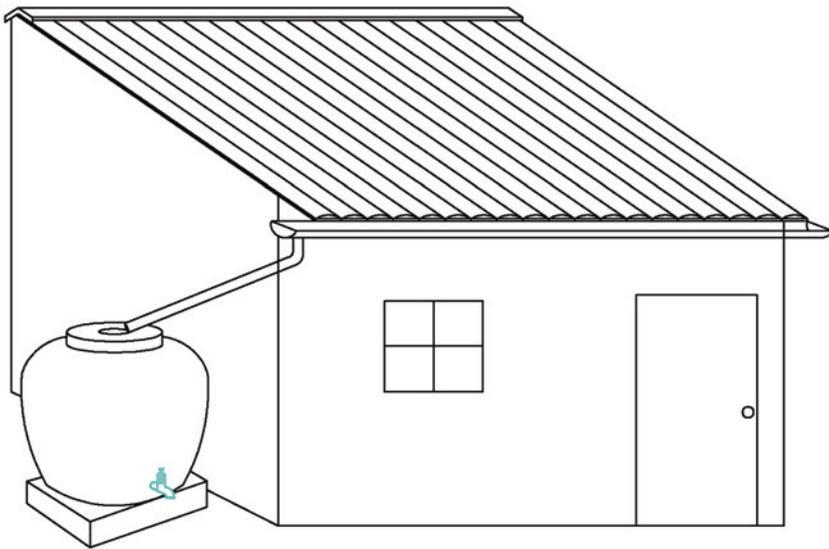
2 m³ 'Thai Jar' ferrocement roof tank common in S.E. Asia (Gould and Nissen-Petersen 1999)
